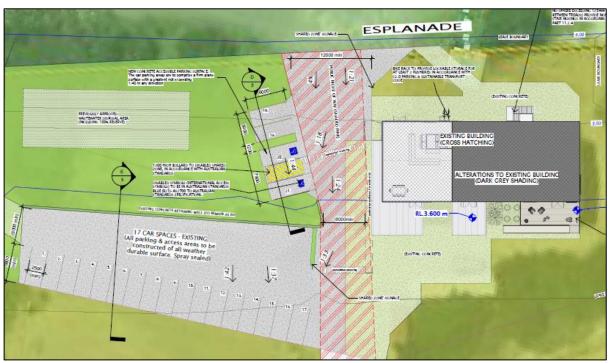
Site Plan, showing the proposed reconfigured vehicle parking and pedestrian crossings.
